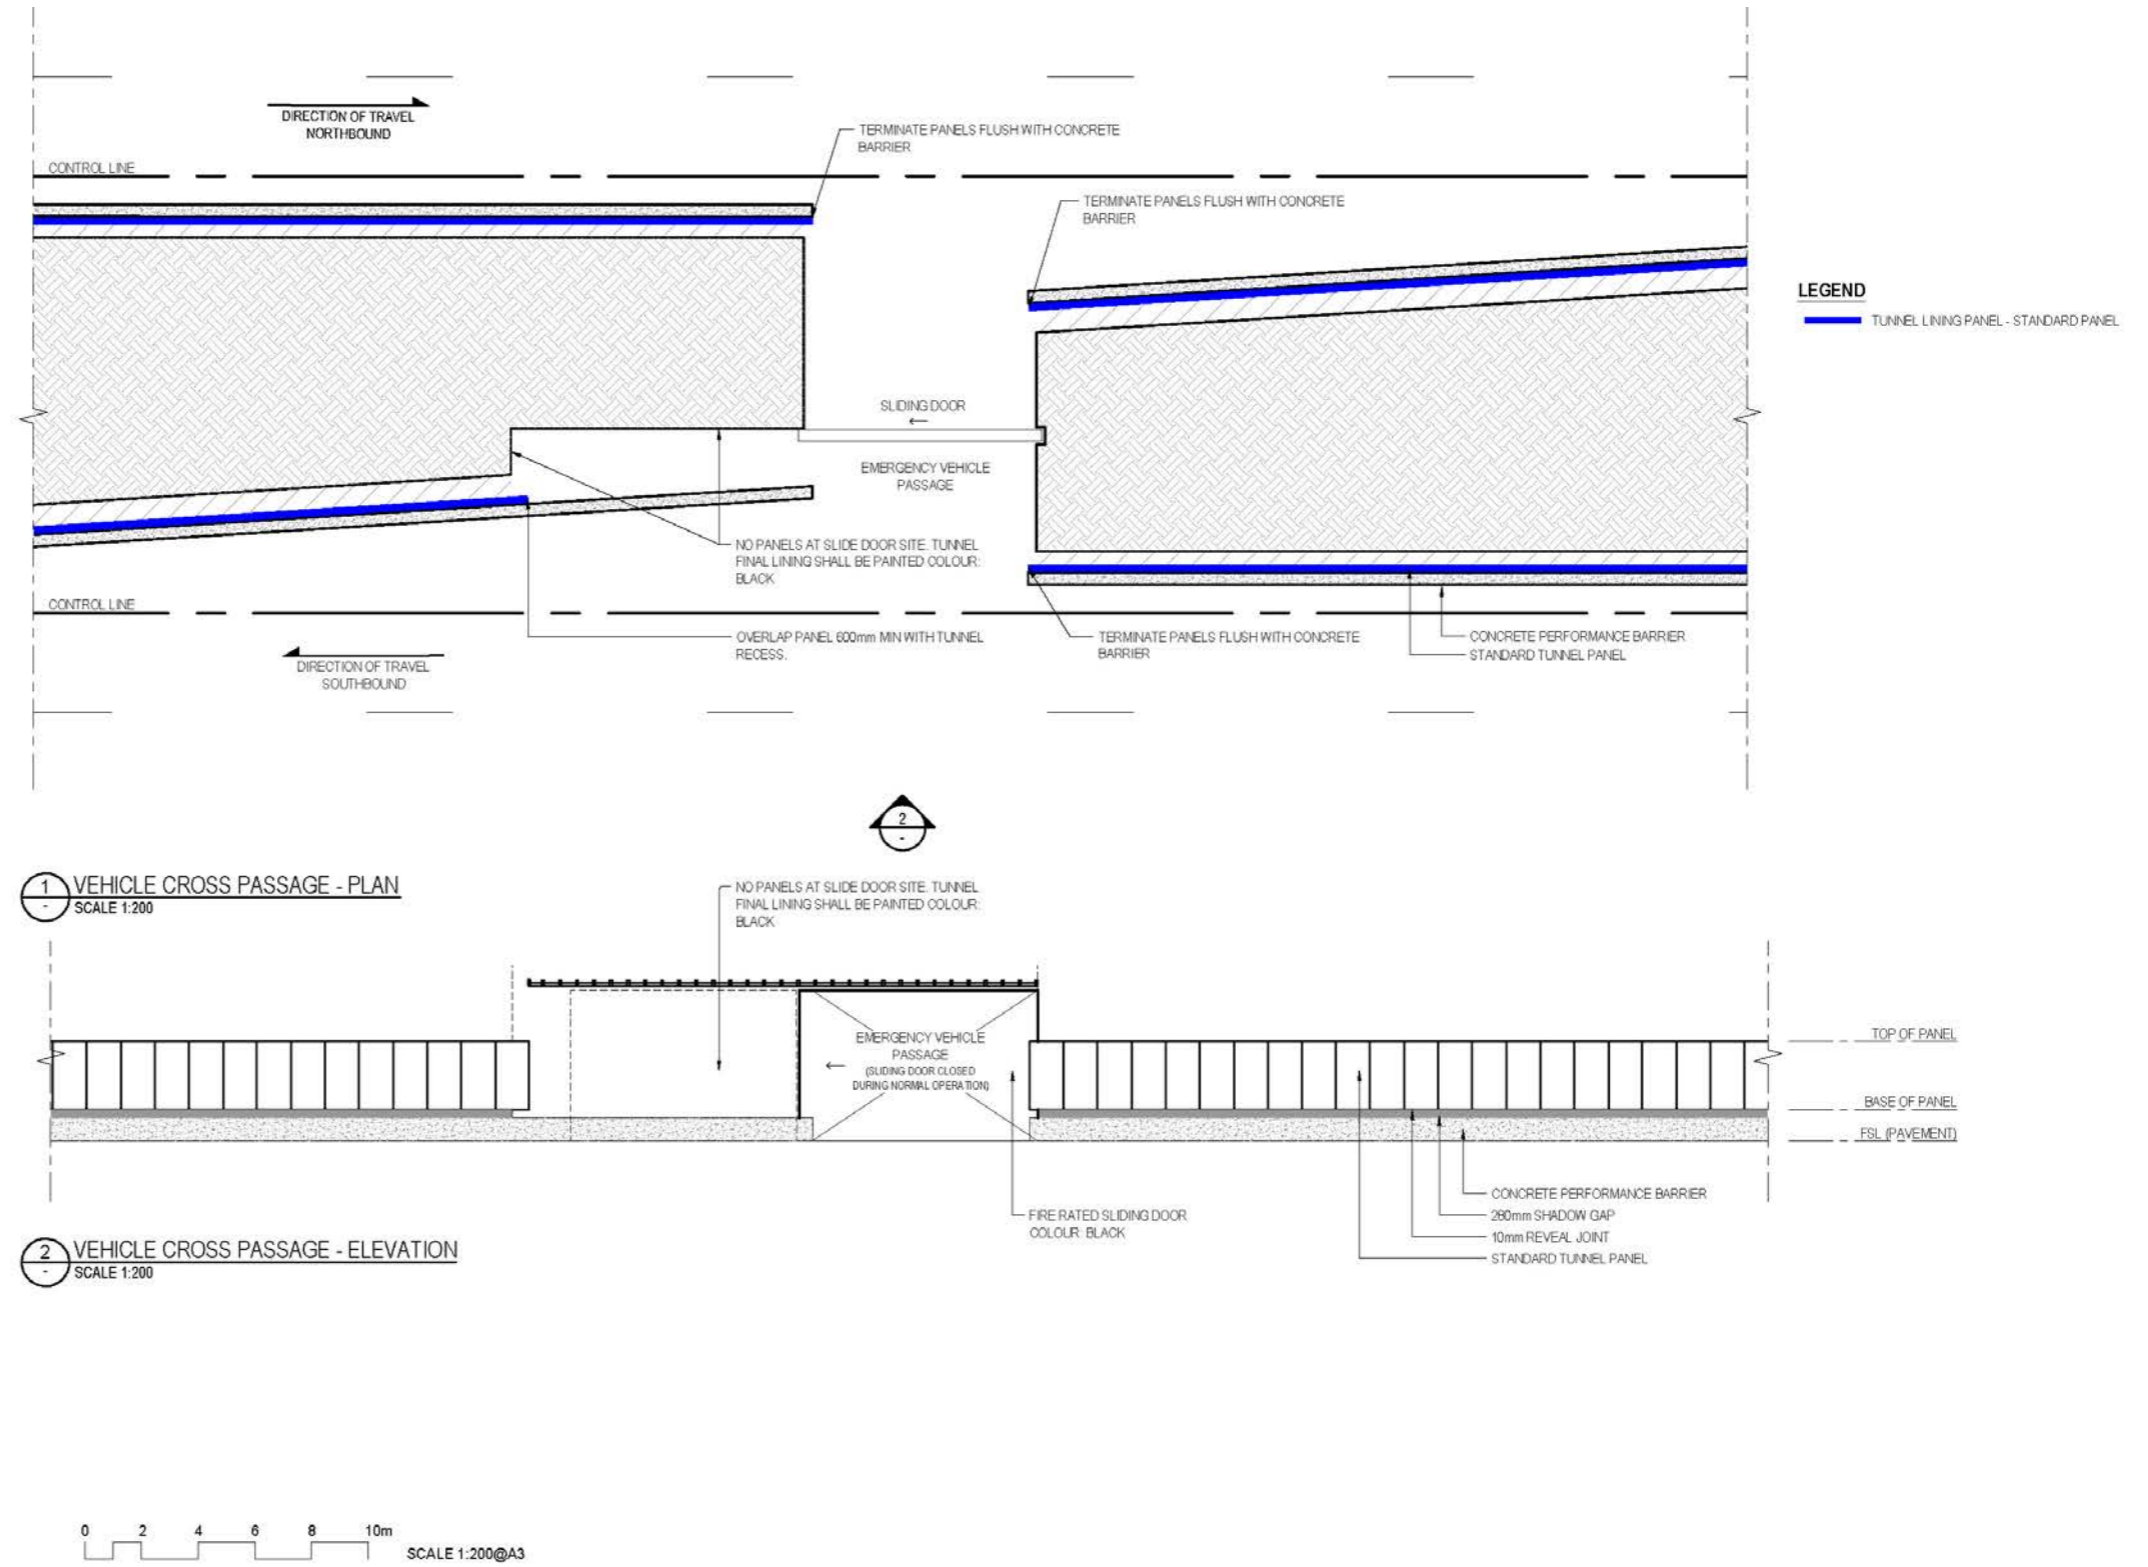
Tunnel – typical emergency vehicular cross passage - key plan
